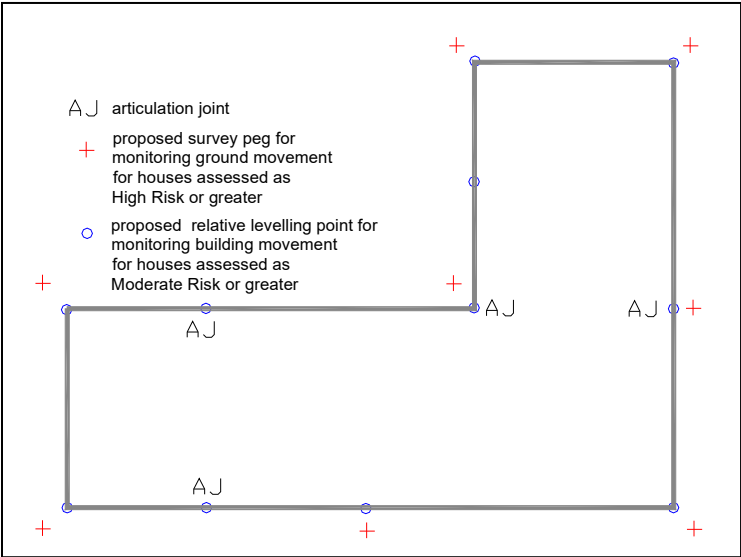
Schematic layout for ground movement and building level surveys around a typical building
